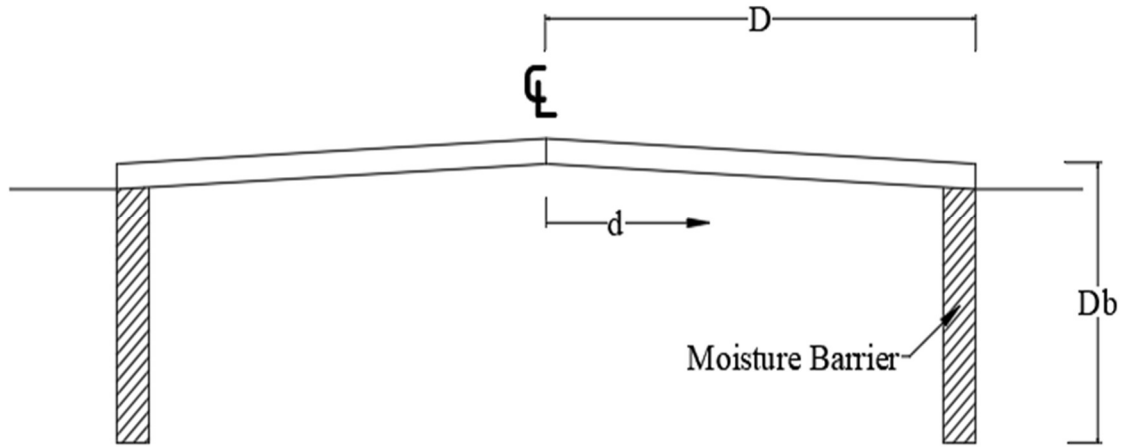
Typical Cross-Section of a Pavement with Vertical Moisture Barriers (Jayatilaka, 1999)
